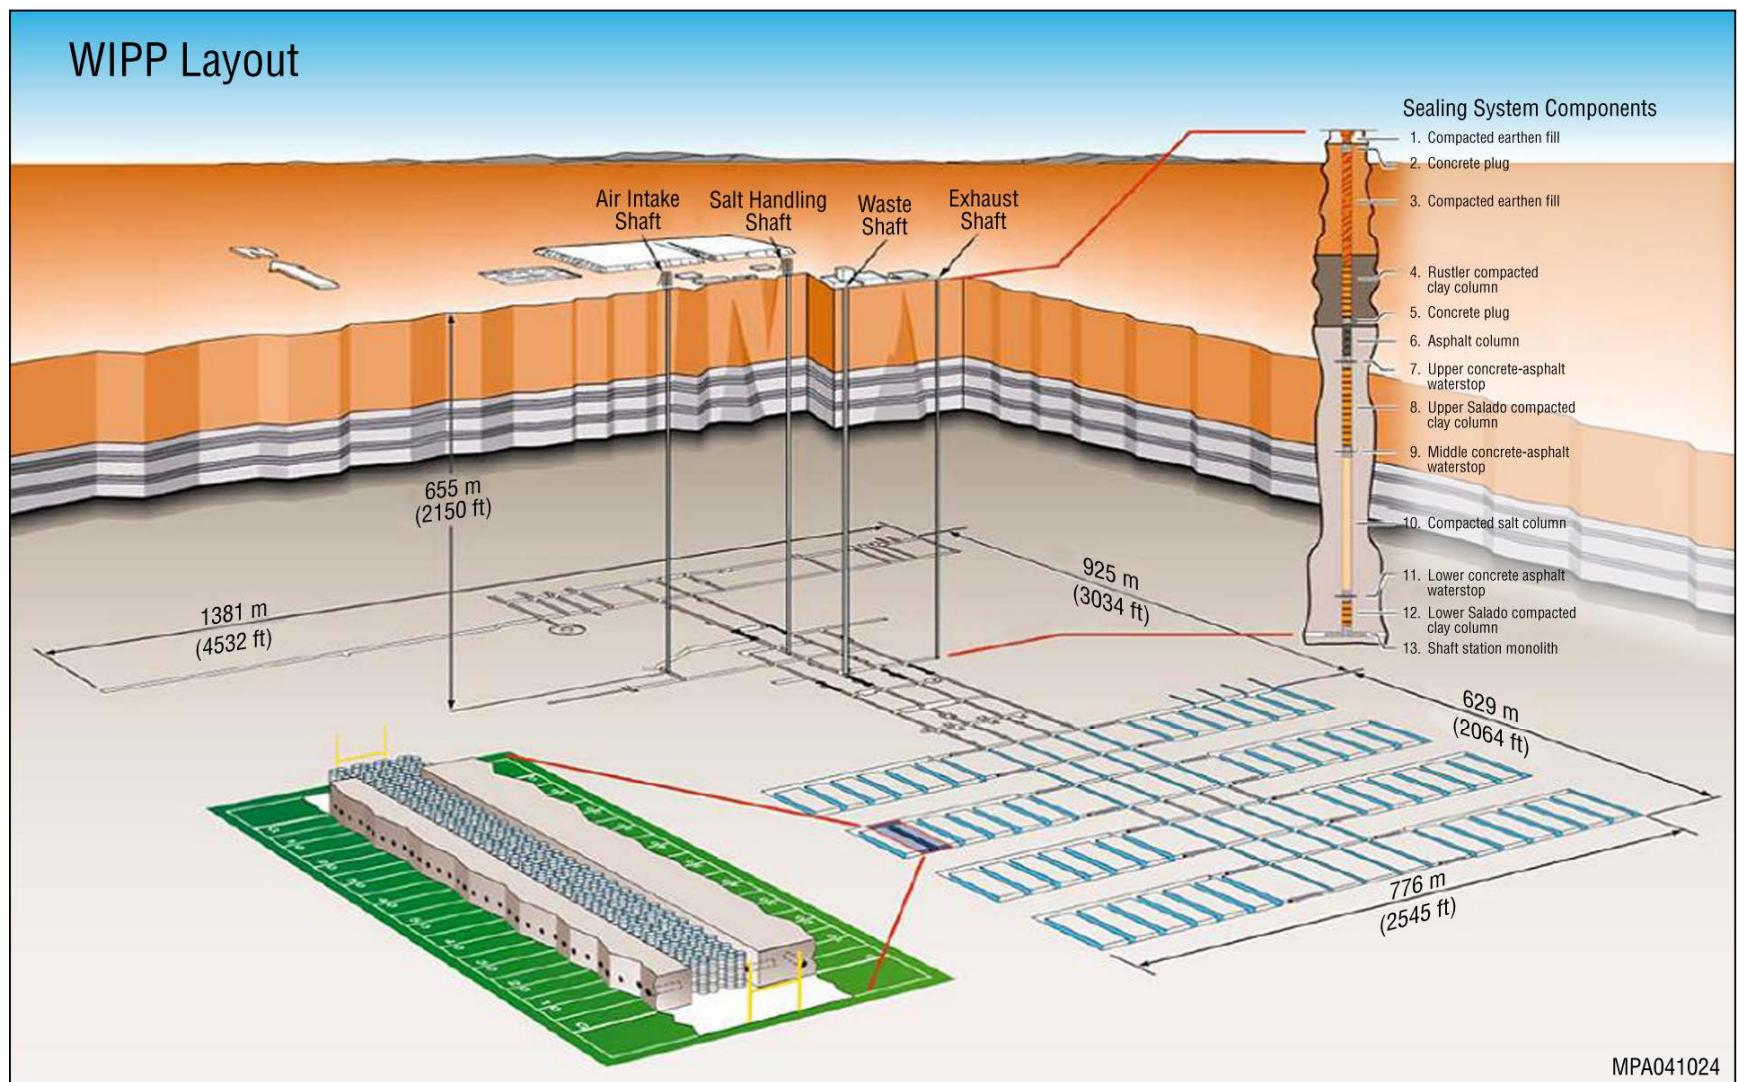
Spatial View Showing Underground Shafts at WIPP (Source: Sandia 2008a)
